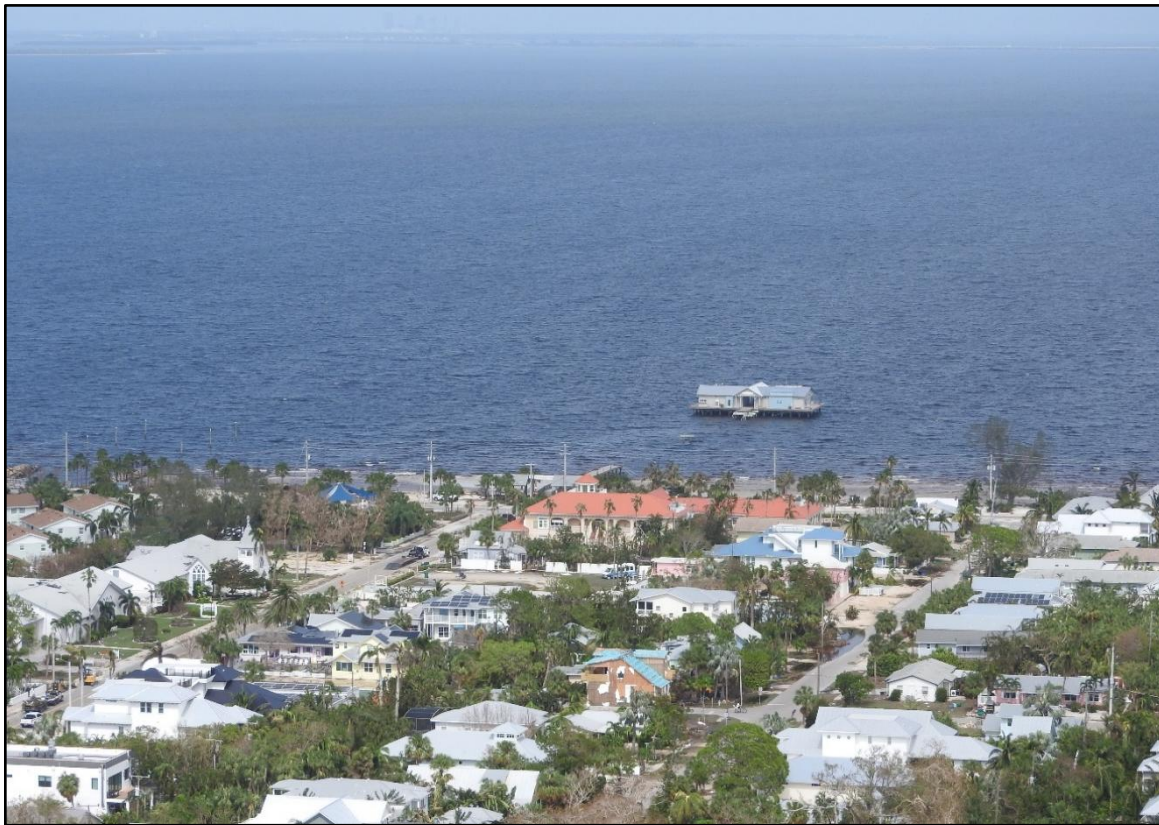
Milton destroyed the Anna Maria Island City Pier and damaged the restaurant and bait shop at Pine Avenue.
